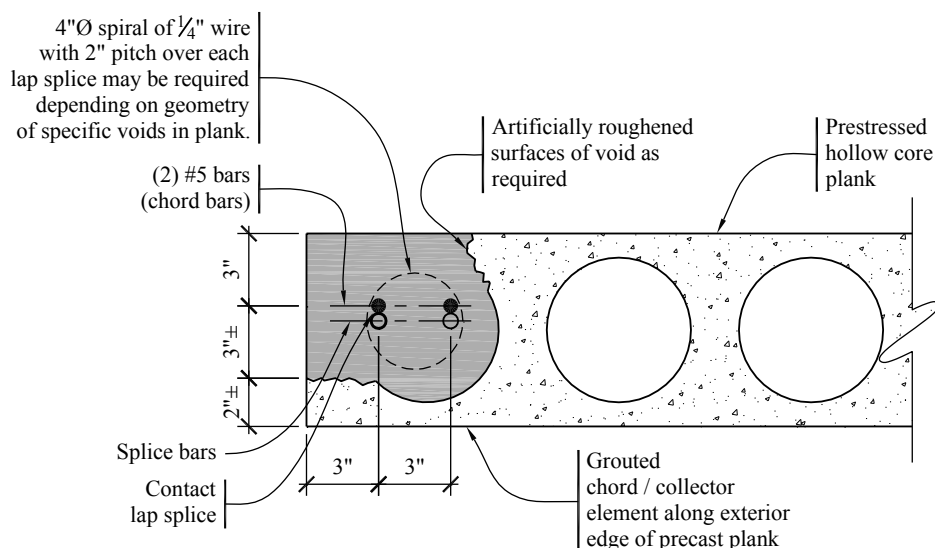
Joint 3 chord reinforcement at the exterior edge
